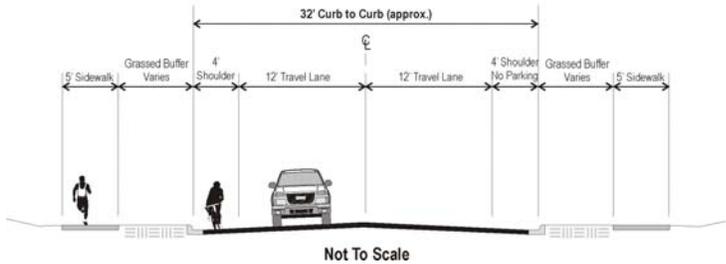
Typical Section-Baker Avenue (7th Street to 10th Street)
